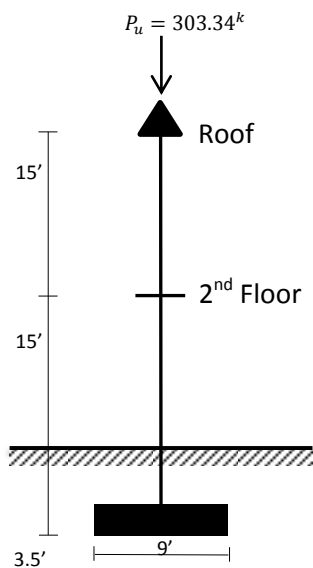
Building’s column and footing framing diagram. Image by George Andonie.
